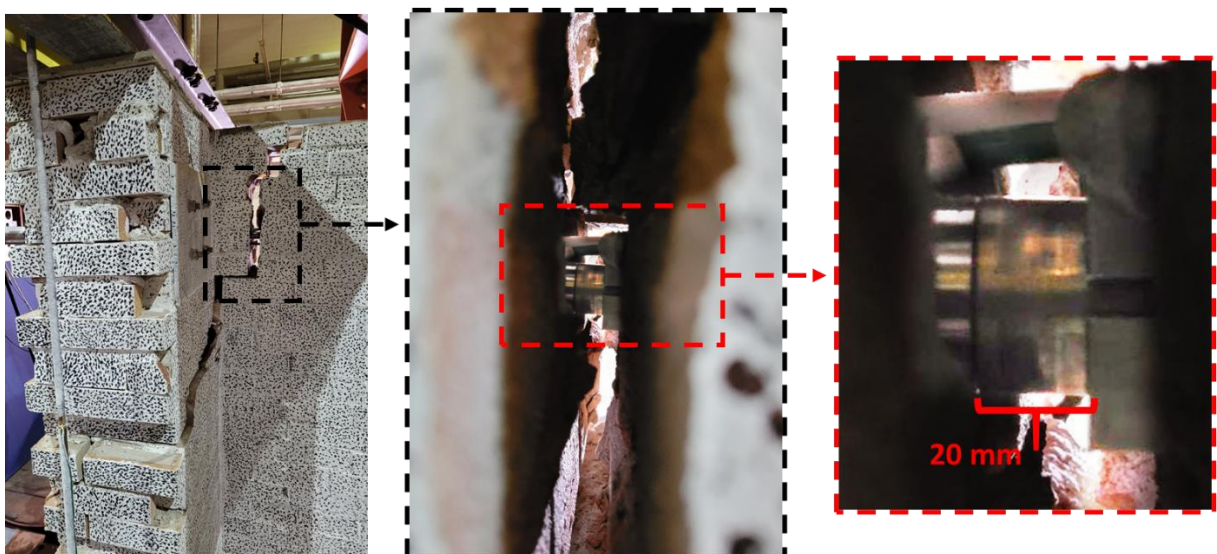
Visual inspection of device through the separation crack.
